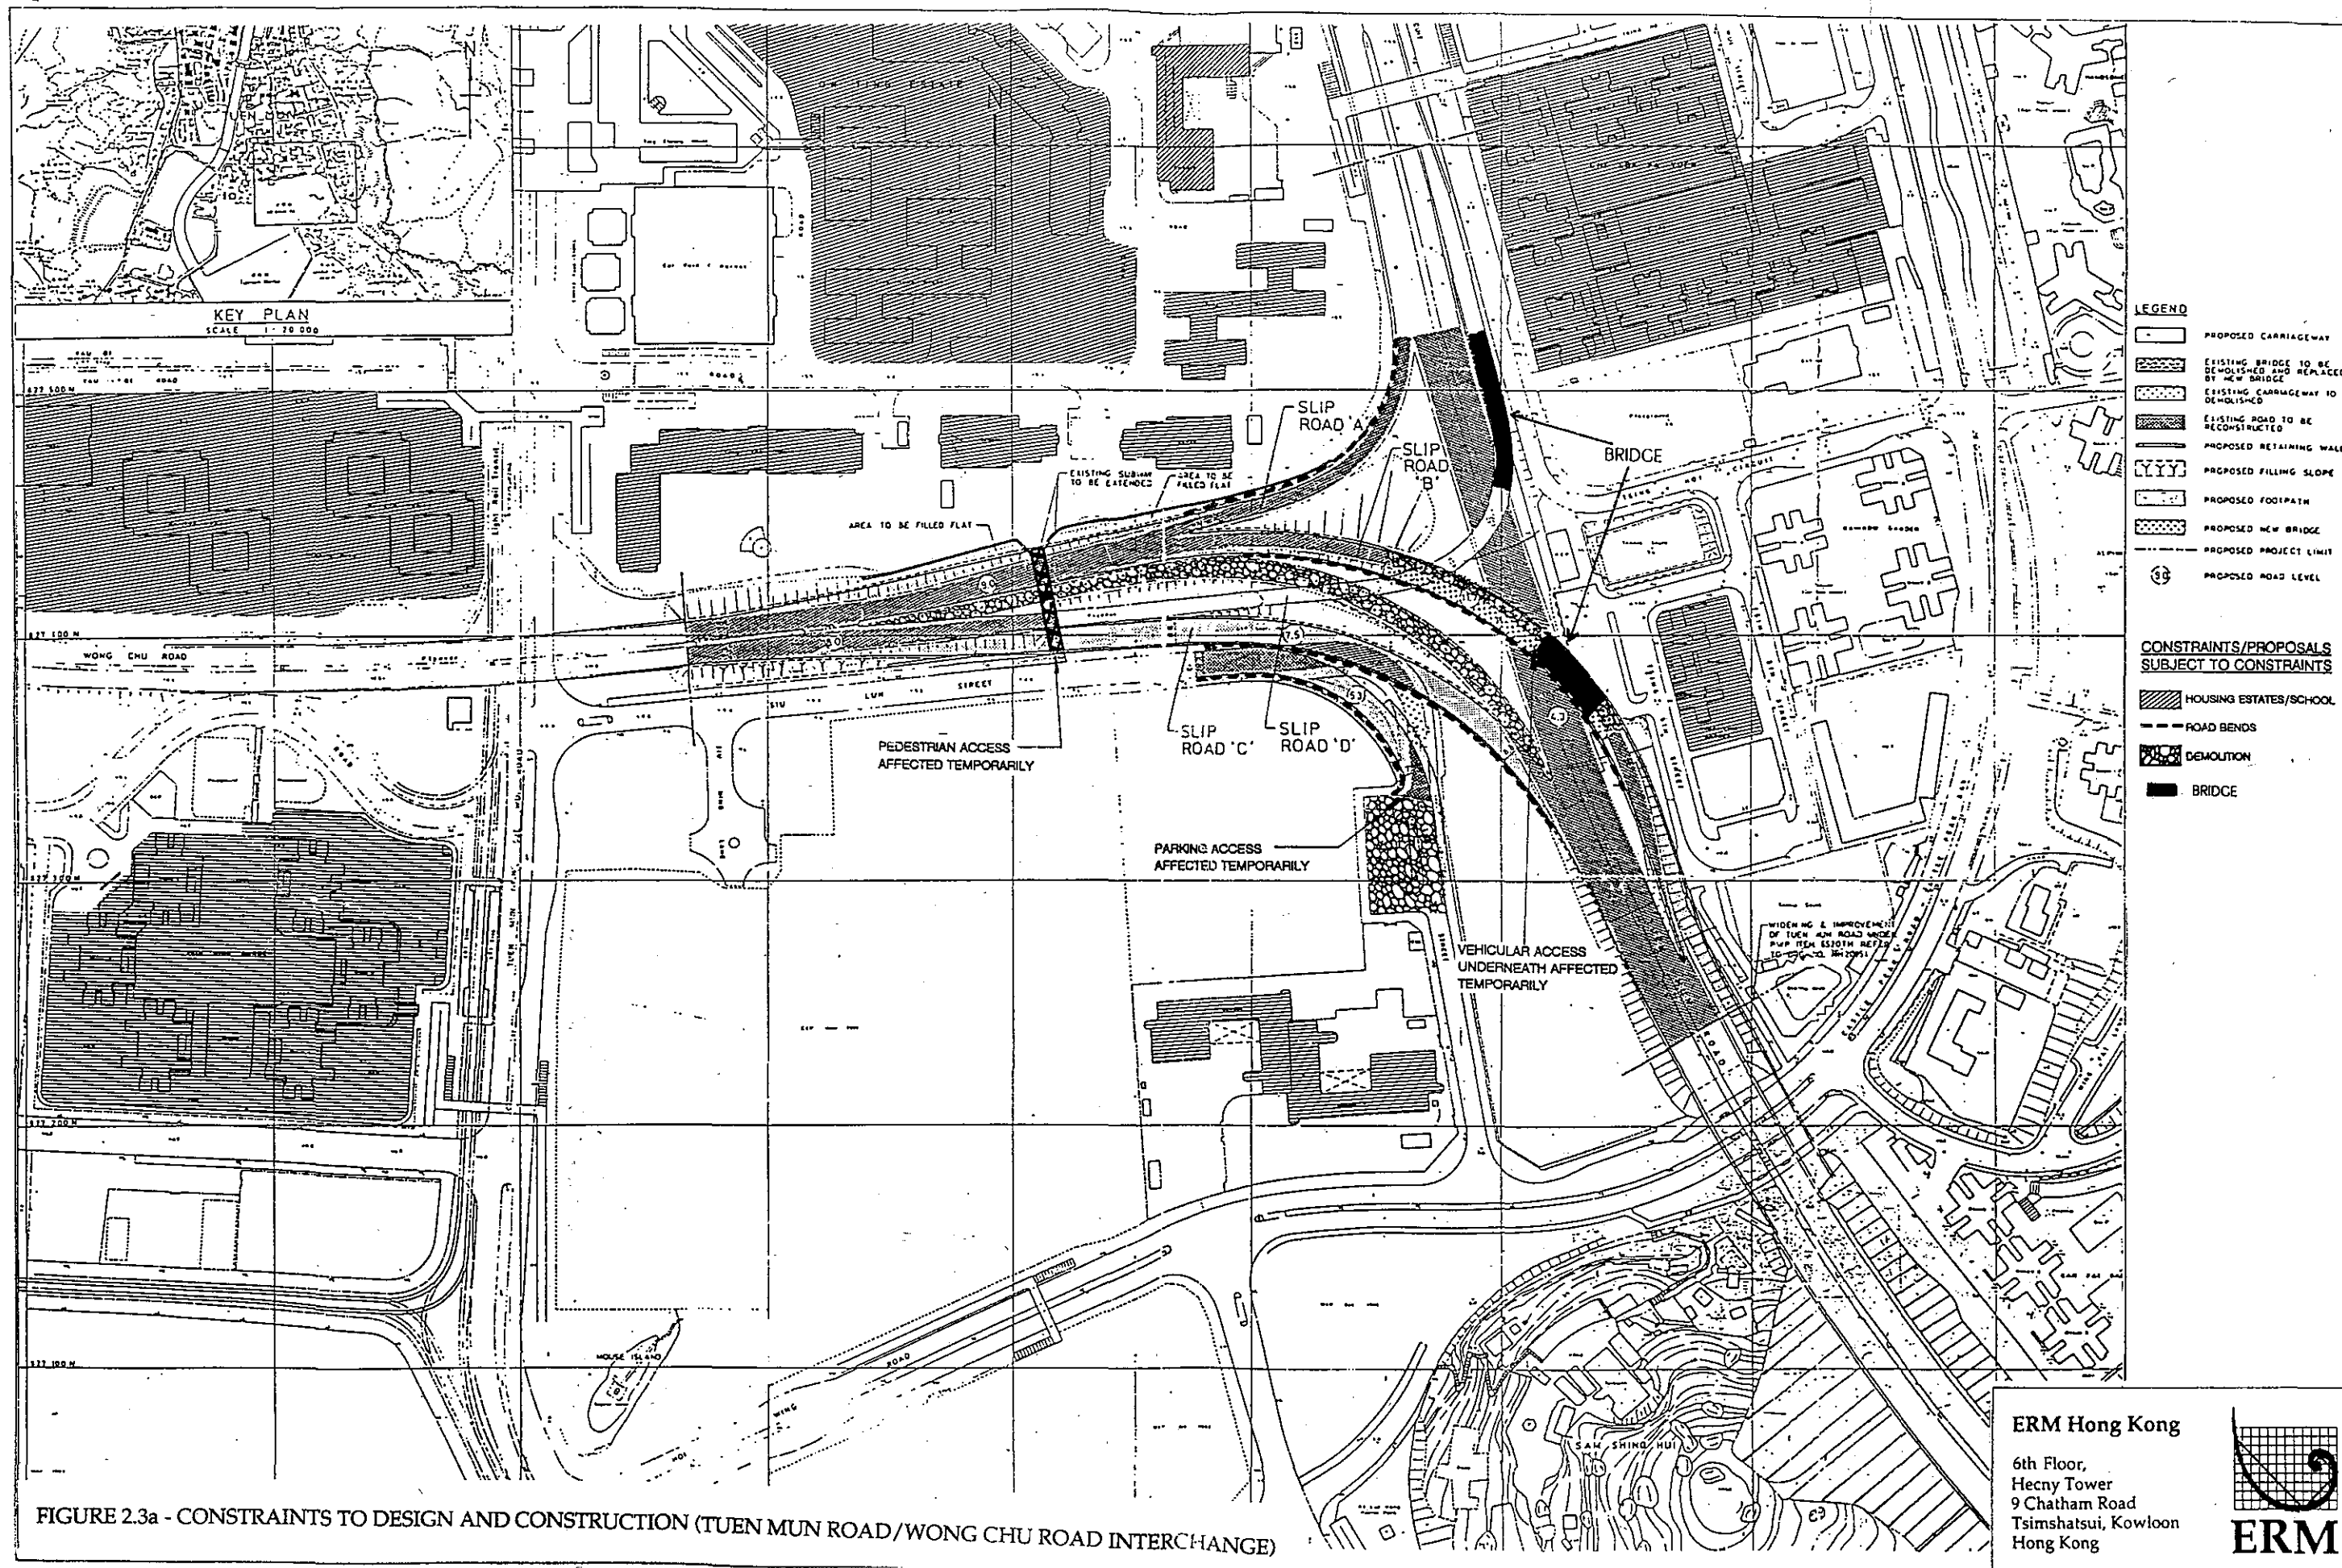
CONSTRAINTS TO DESIGN AND CONSTRUCTION (TUEN MUN ROAD/WONG CHU ROAD INTERCHANGE)
